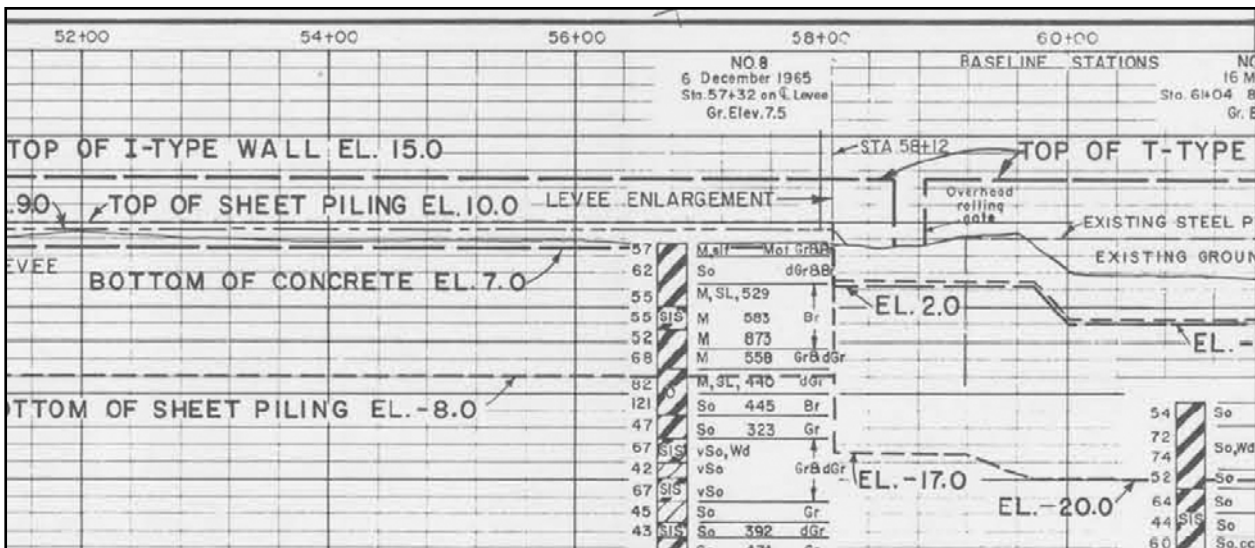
Soil Boring 8 Shows Fat Clay Soil and Sheetpile Elevation (from DM3 Chalmette drawing file H-2-23820, plate 5)
